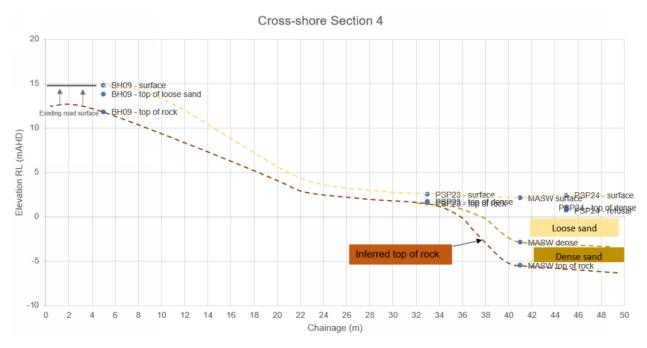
Geotechnical cross-shore profile – Section 4 (Boat Beach)
